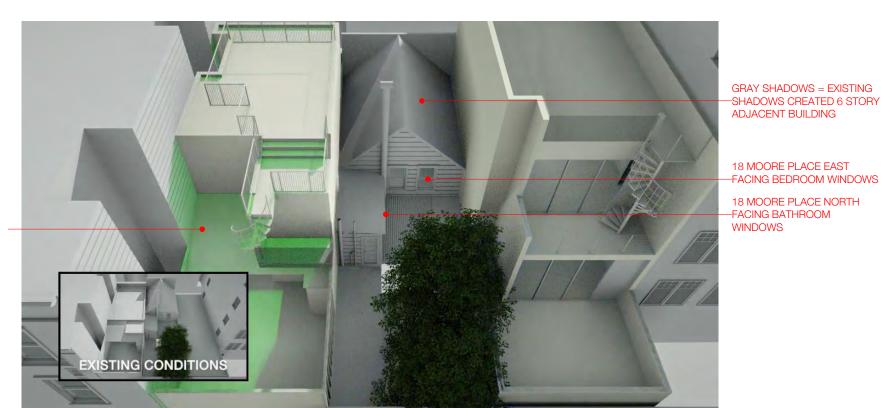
PROPOSED SHADOWS - JUNE 21ST, 6:00AM LOOKING WEST
